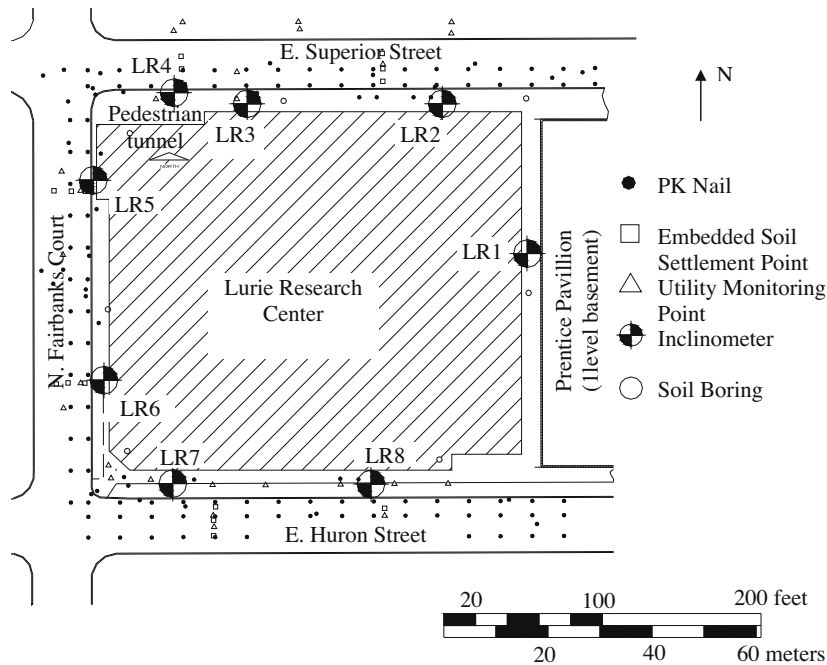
Plan view and instrument locations of Lurie Center excavation.
